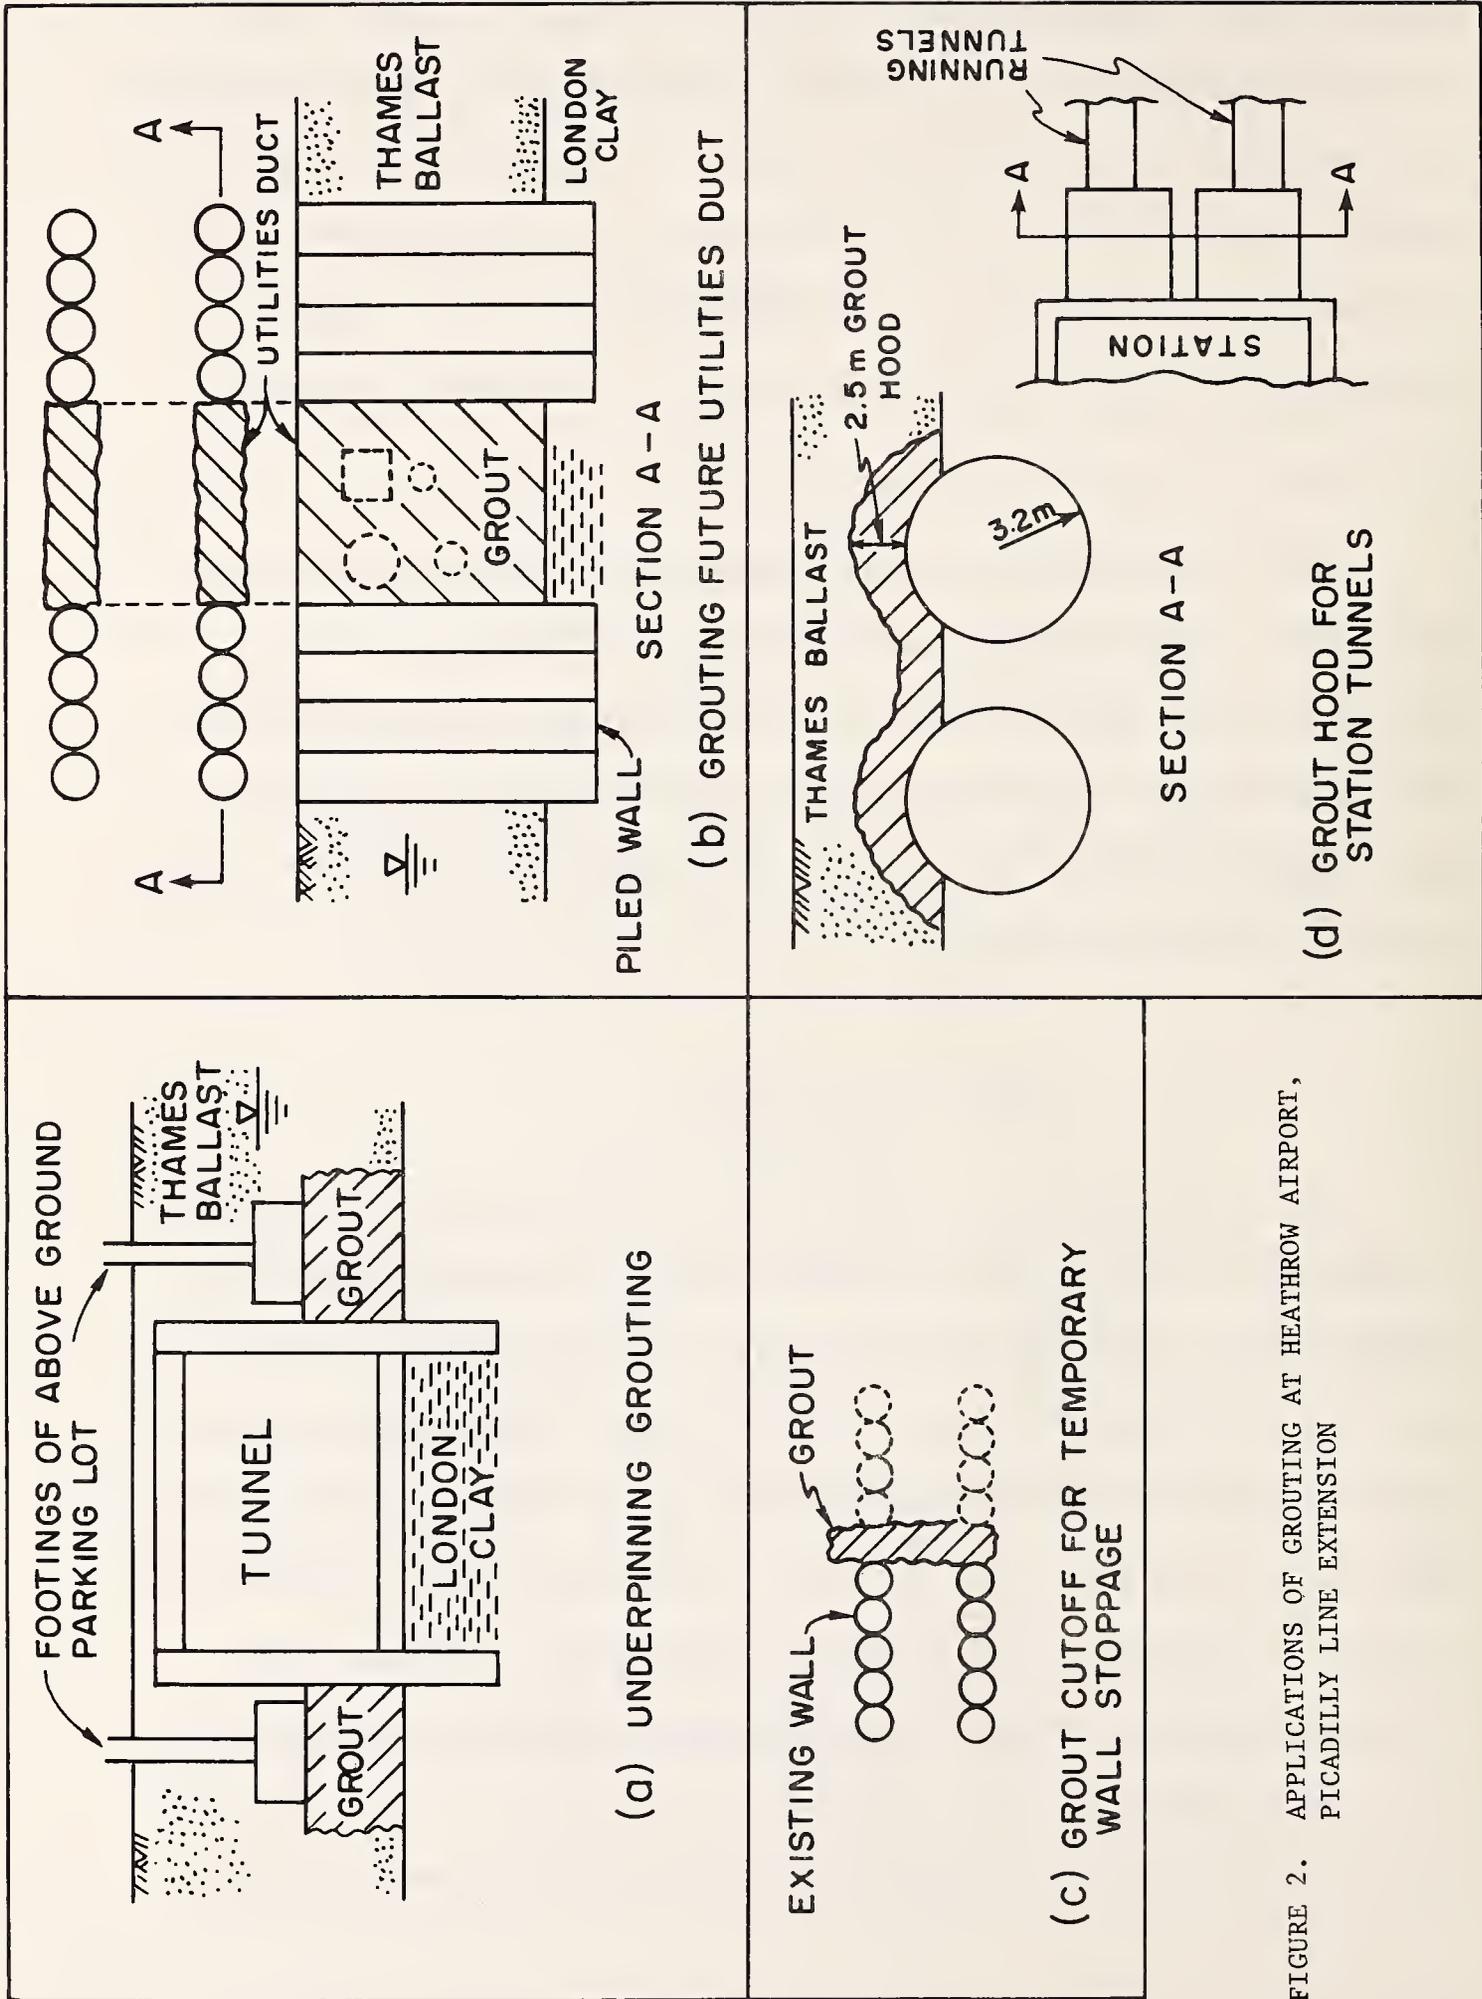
APPLICATIONS OF GROUTING AT HEATHROW AIRPORT, PICCADILLY LINE EXTENSION
